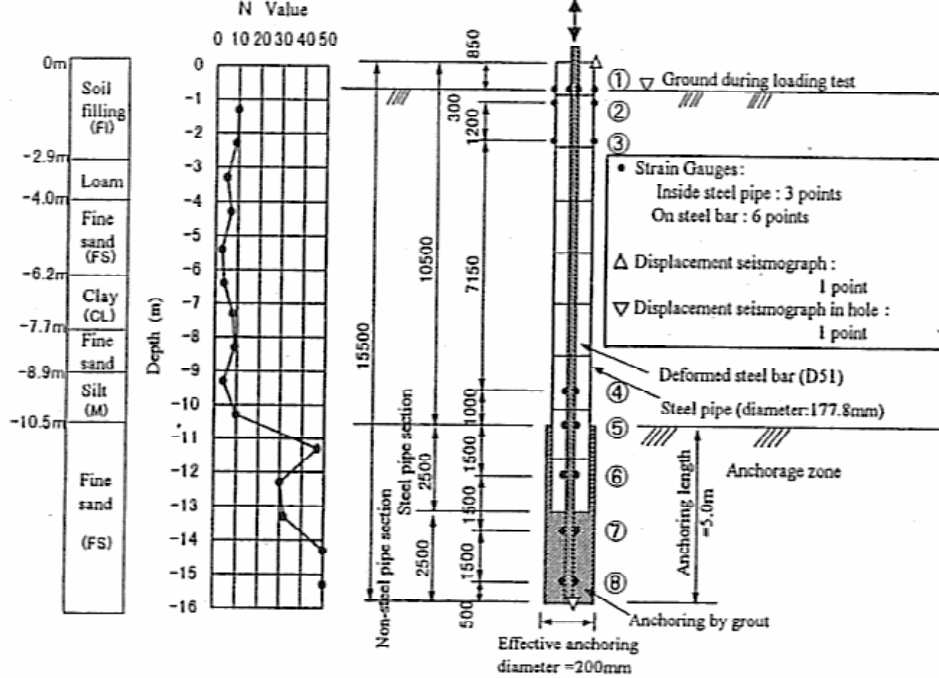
Soil profile at the test site and the general view of the test pile¹³⁾.
